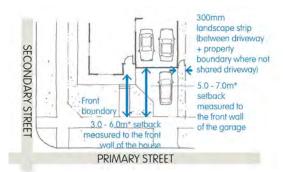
| Front Loaded Lot - Driveway (>/< 300m2)
